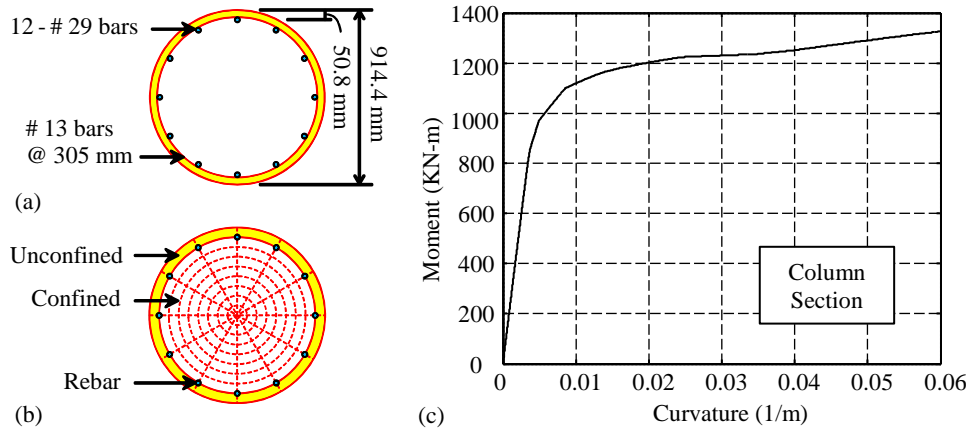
Reinforced concrete column: (a) section geometry, (b) fiber section discretization, and (c) moment-curvature behavior (Figures 3.4a and 3.4b adapted from Nielson, 2005)
